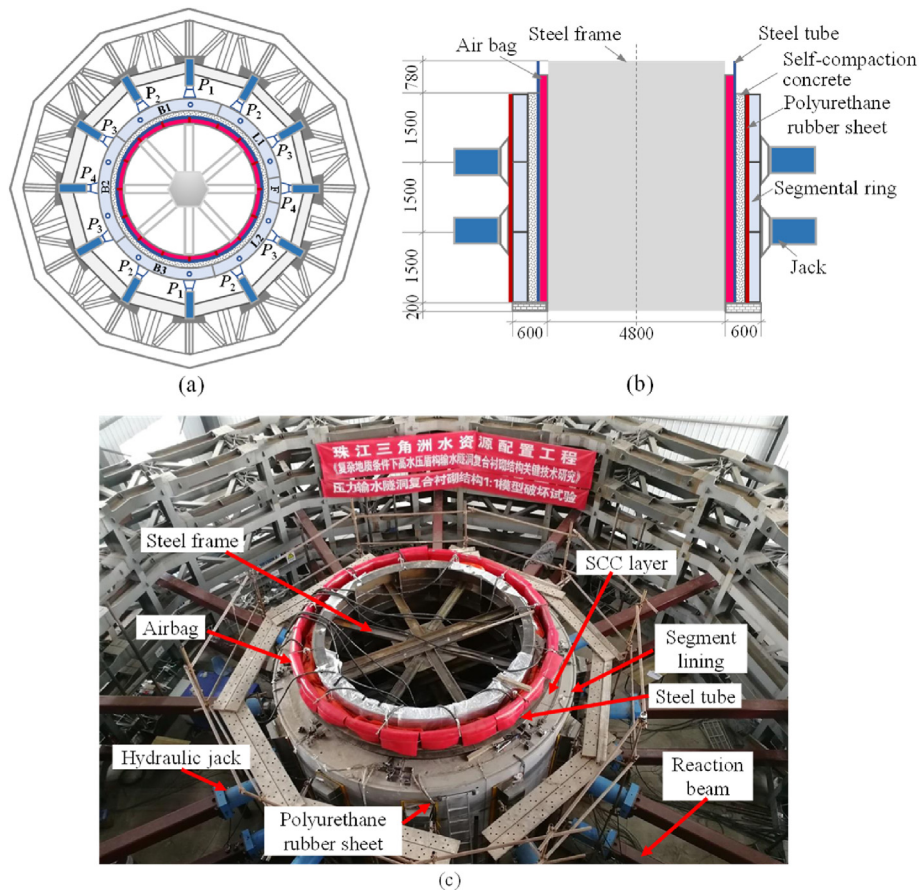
Test setup: (a) Planar views of the test setup, (b) section views of the test setup (unit: mm), and (c) completed loading test setup.
